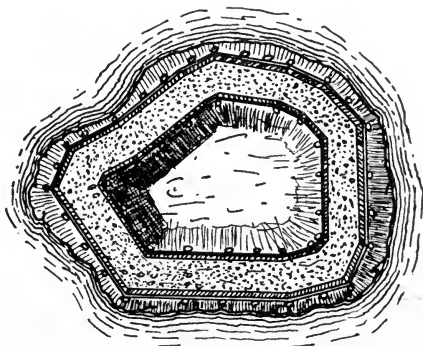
Plan of the Ledge of Rock at Henderson's Point.
